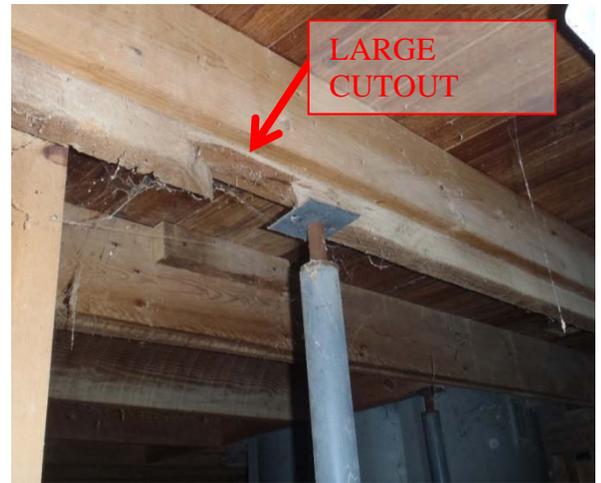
View of 2 1/2" diameter steel screw jacks supporting floor joists. Jacks are unsecured at top and bottom and load distribution plate is not used at the bottom. Note cutout section and sister joist in the supported floor joist.
